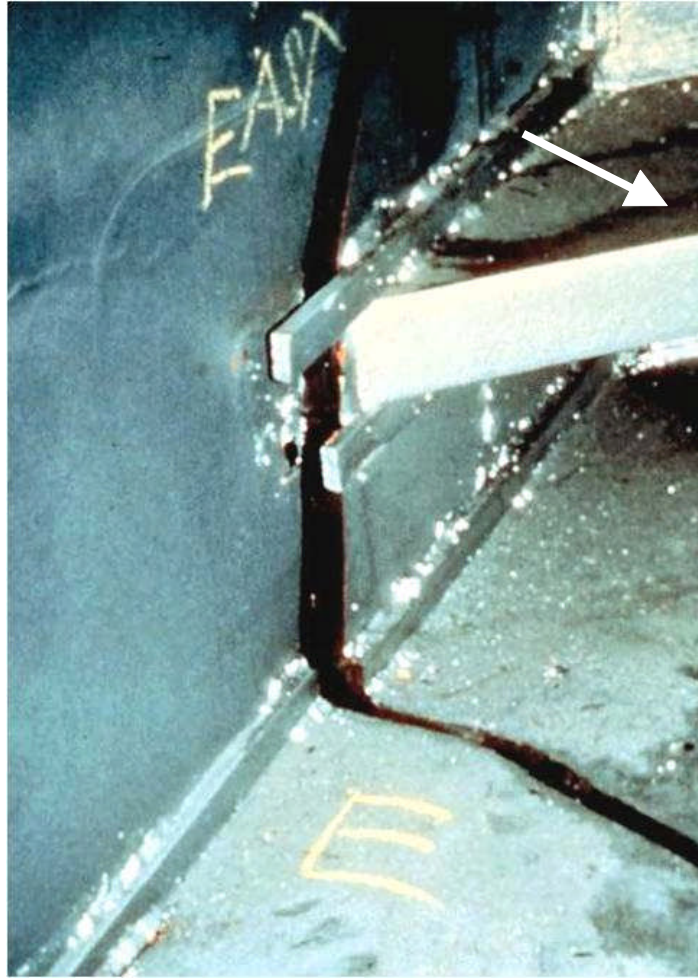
Poor Quality Welds Inside Cross Girder
